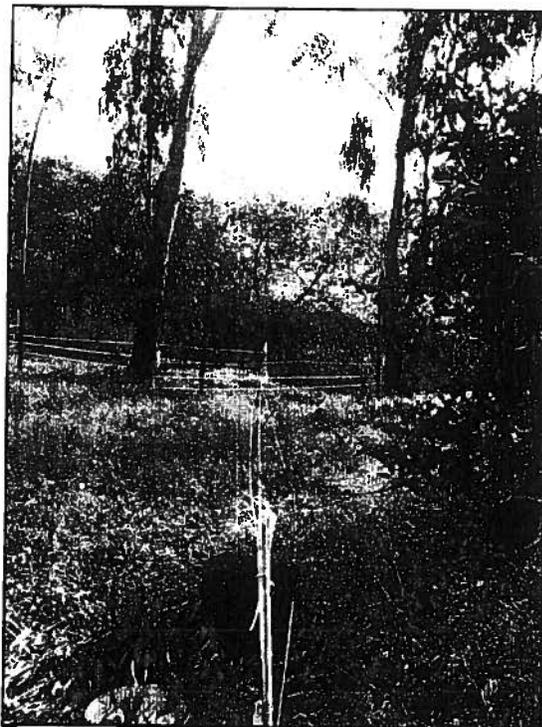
Facing east-northeast from proposed sewer manhole location #1 to proposed manhole #2. Reidy Creek is in the background.
